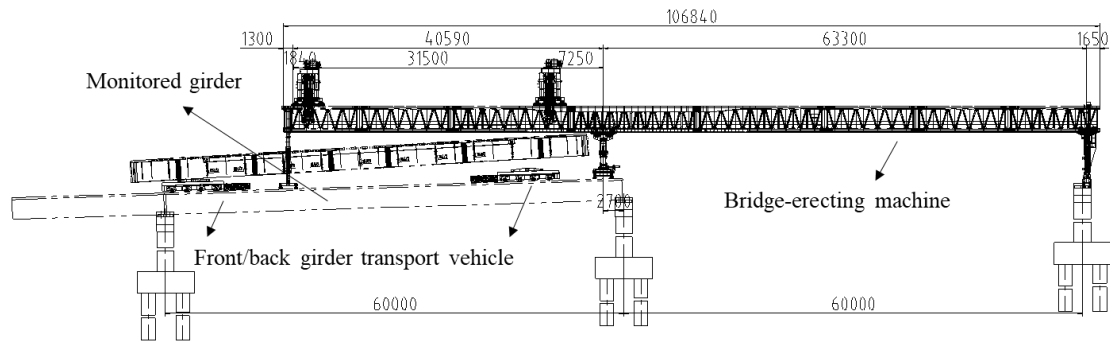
Installation of the composite girder through bridge-erecting machine (mm)
